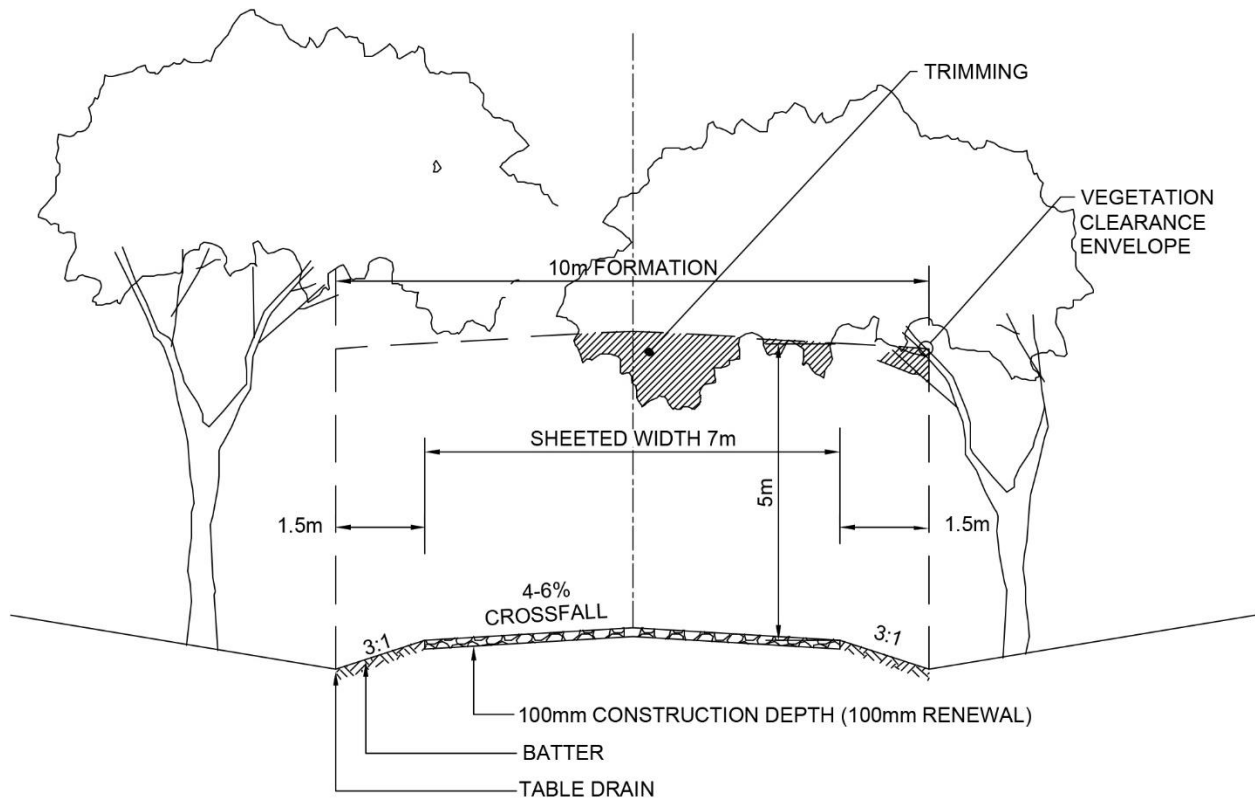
Rural Sheeted Category 3 Construction Cross Section
